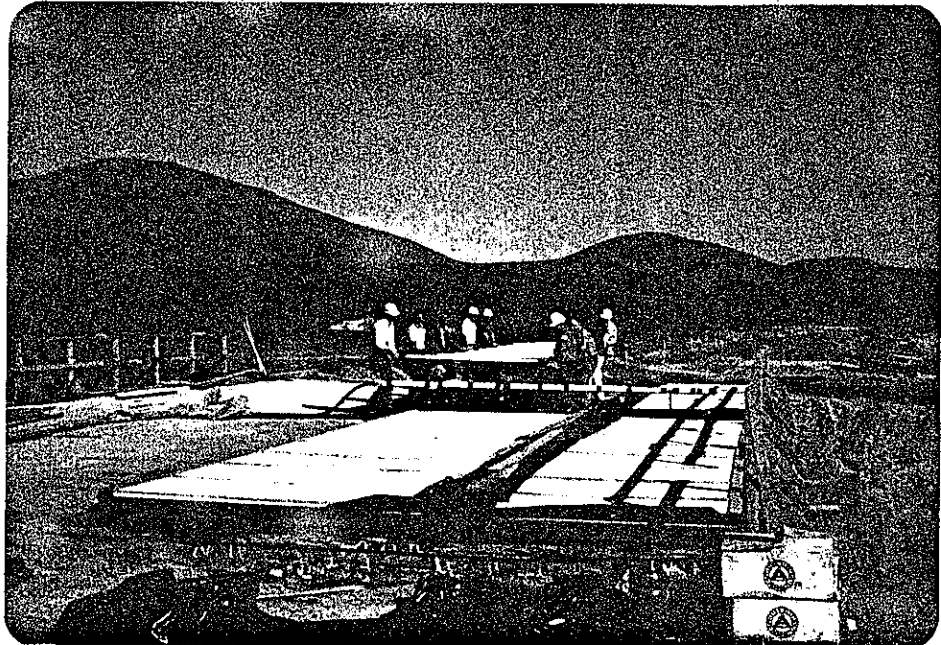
Steam Chamber Being Carried Manually into Position. Steam Line and Manifold in Place.
